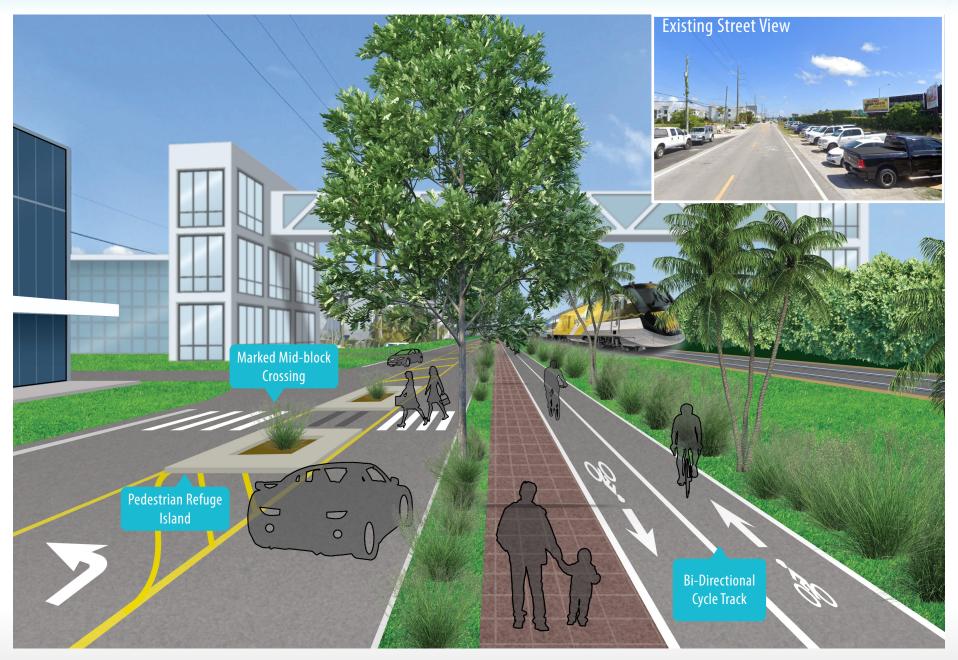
Proposed recommendation. View looking north along West Dixie Highway.
